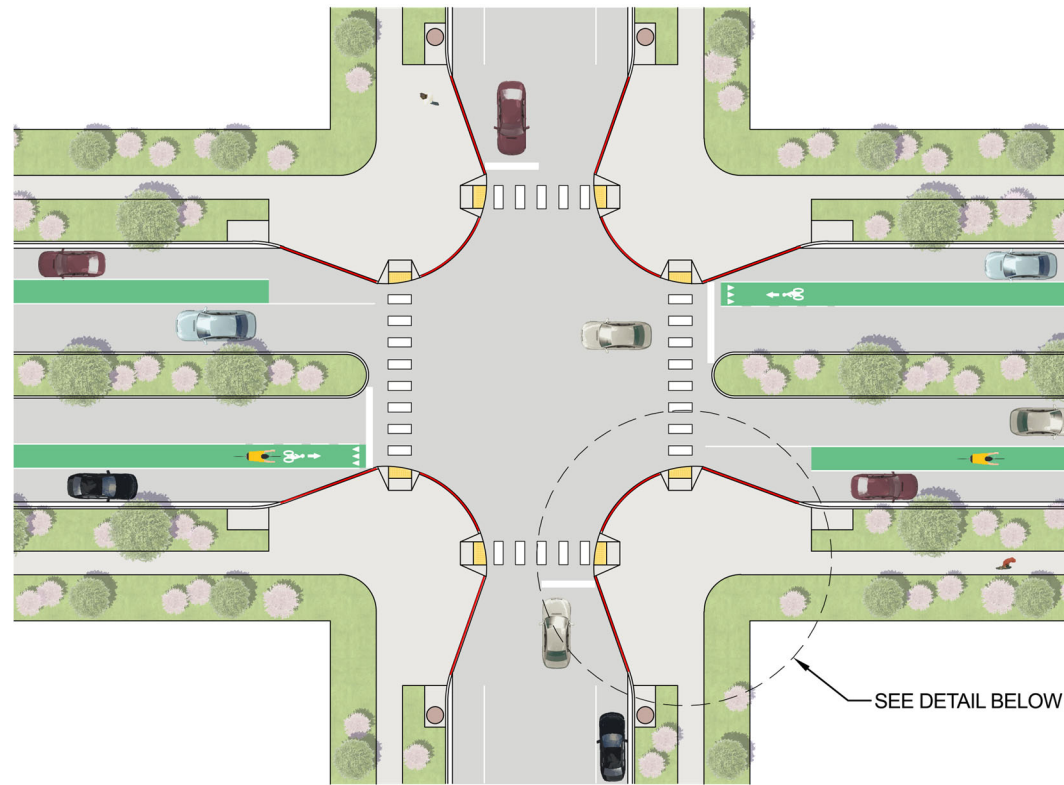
INTERSECTION POP-OUTS PLAN VIEW
